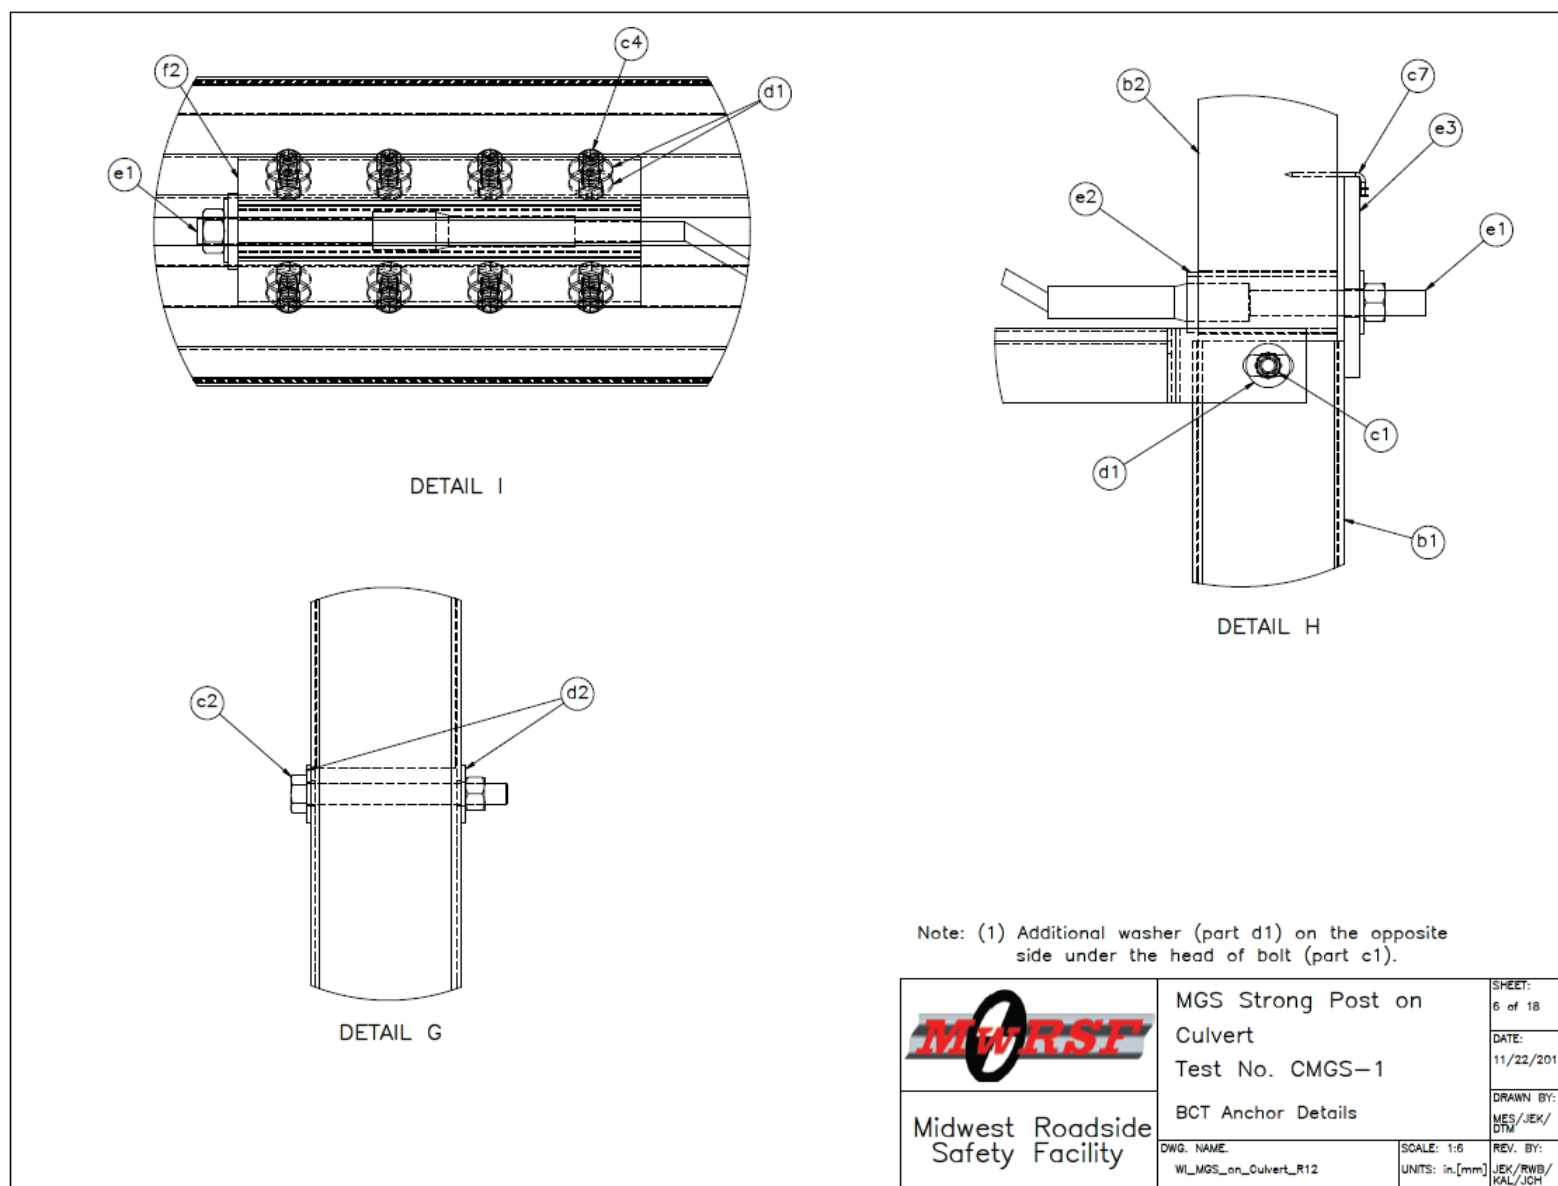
BCT Anchor Details, Test Nos. CMGS-1 and CMGS-2
